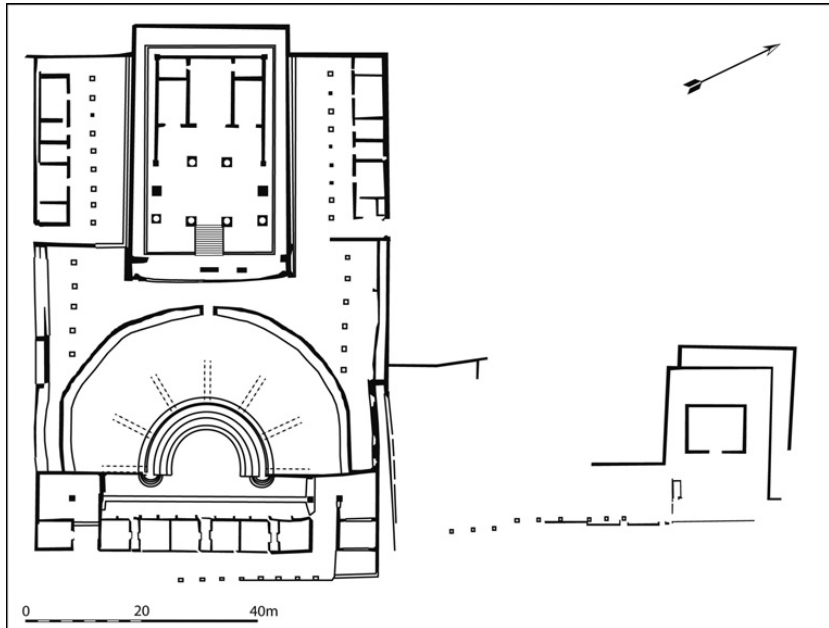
Pietrabbondante schematic plan of the Theatre – Temple complex.
